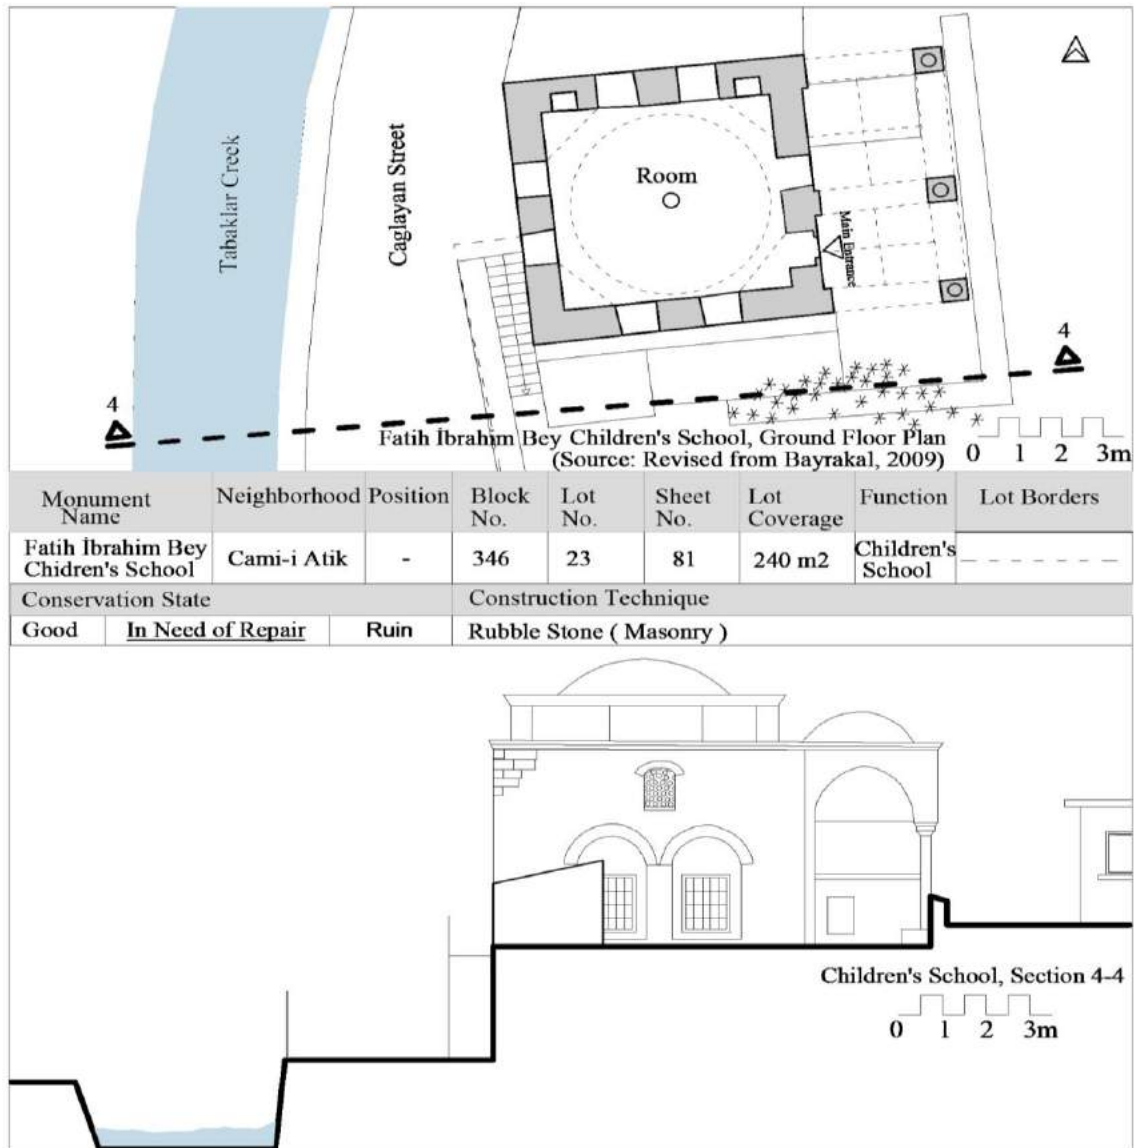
Ground floor plan and south elevation, Fatih İbrahim Bey Children's School
